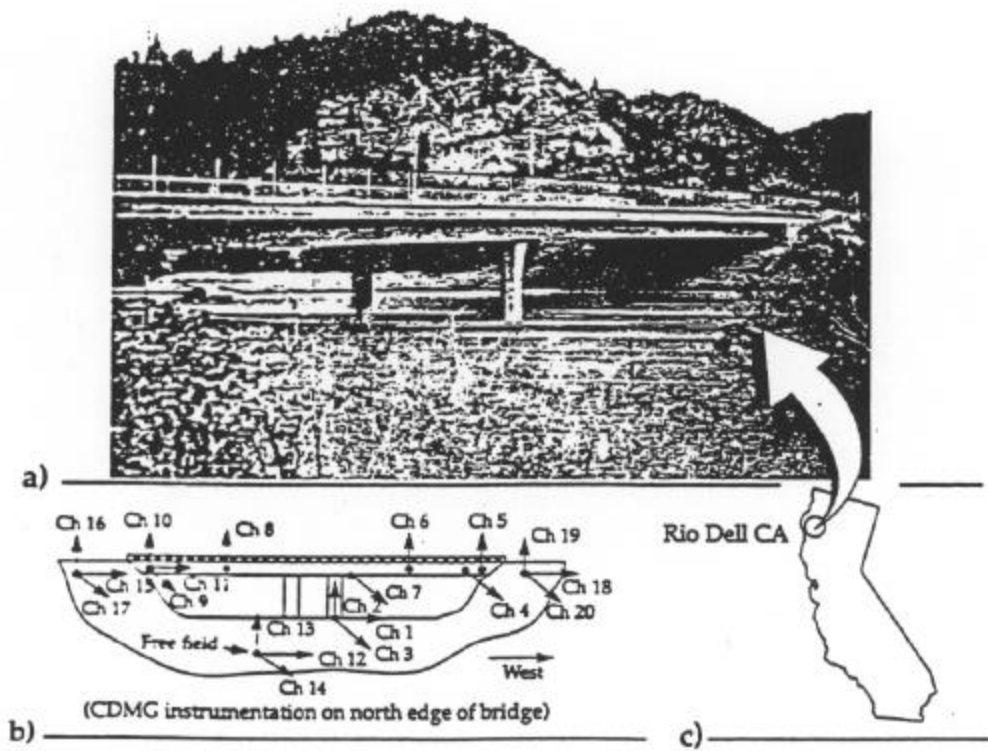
Painter Street Overcrossing, Rio Dell, California a) Bridge Photo, South Side of Bridge Shown; b) CDMG Instrumentation Array; c) Bridge Location (McCallen and Romstad 1994b)
